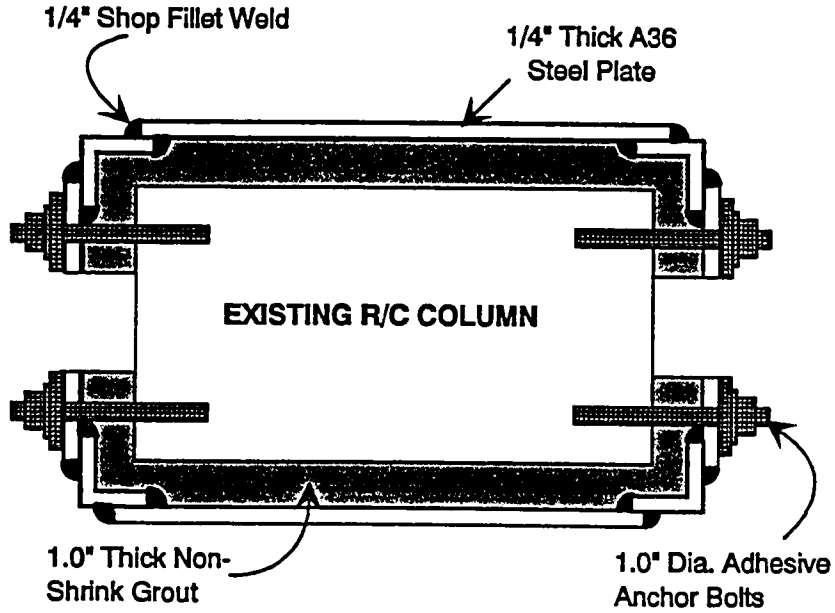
Details of C-Shaped Partial Steel Jacket
